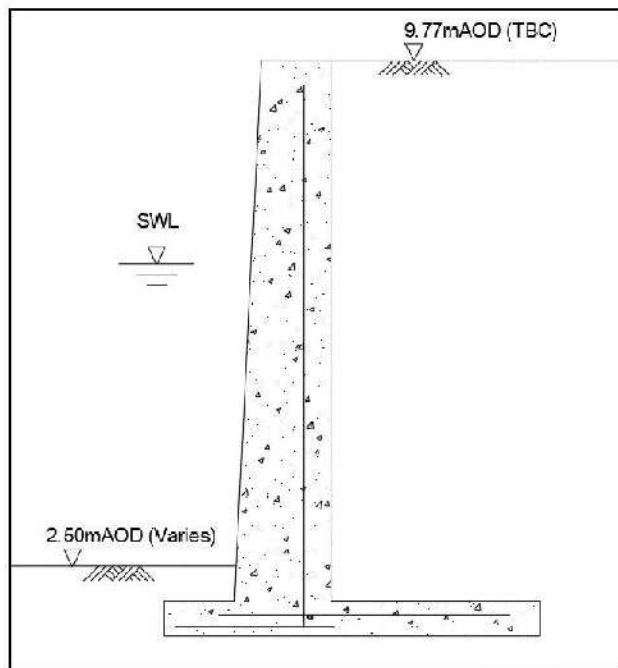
Illustrative sketch of a Cantilever reinforced-concrete stem wall (not to scale).
